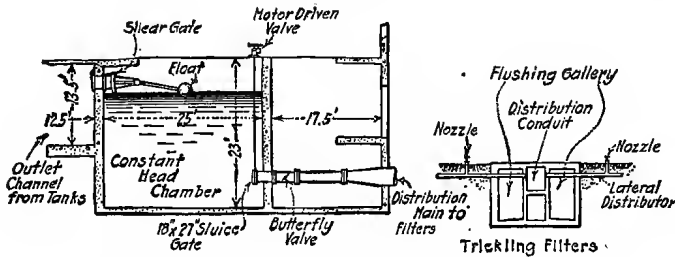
Sectional elevation of dosing apparatus, Baltimore.
